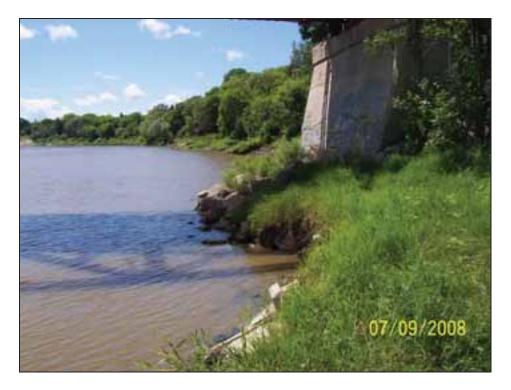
Looking upstream at shoreline from proposed BDI location.
